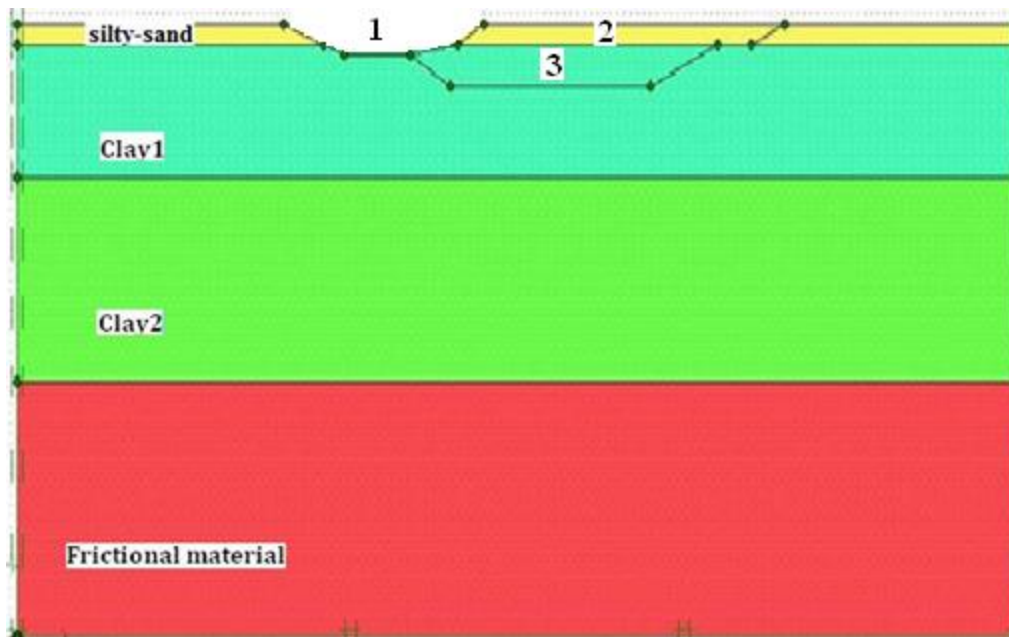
Excavation stages: stage 1, excavation of old E45, which was excavated 50 years ago, stage 2 &3, excavation under the railway bridge for the new E45.
